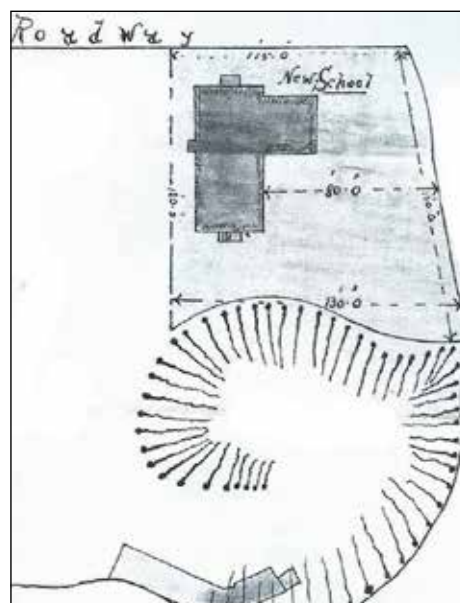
Drawing showing a school as an alternative to the proposed use of the site
